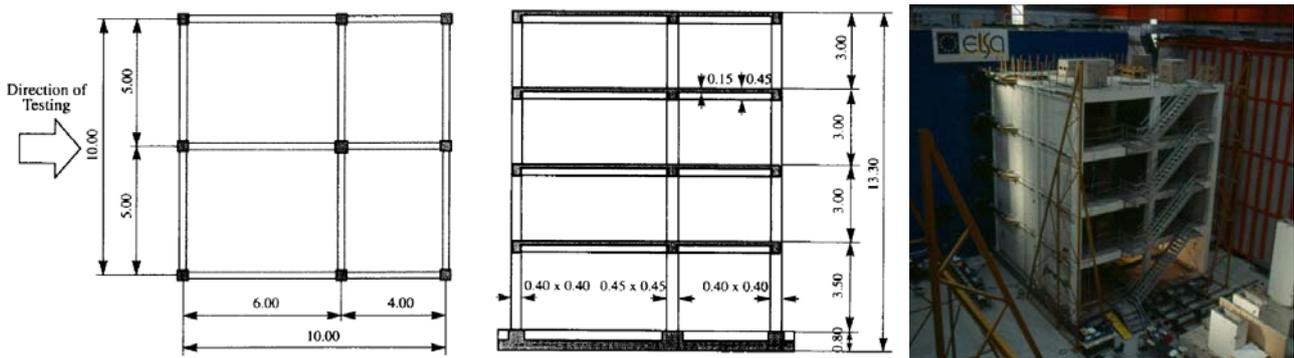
Plan and elevation view of the bare and infilled RC structure.
